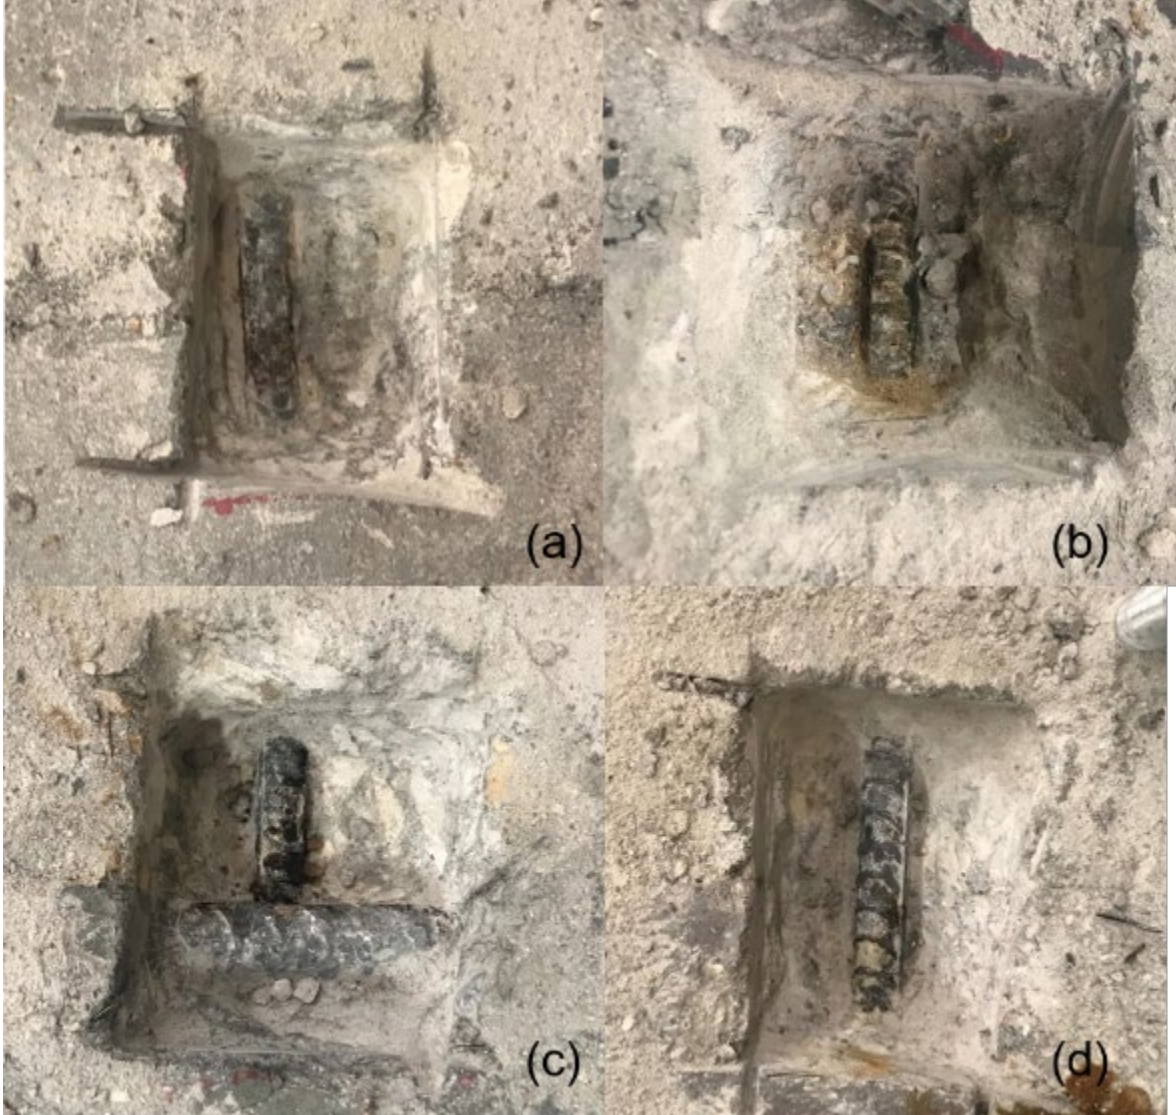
Fourth rebar excavation for large-scale corrosion specimens using (a) ODOT AA, (b) J3, (c) Ductal®, and (d) Phoscrete
